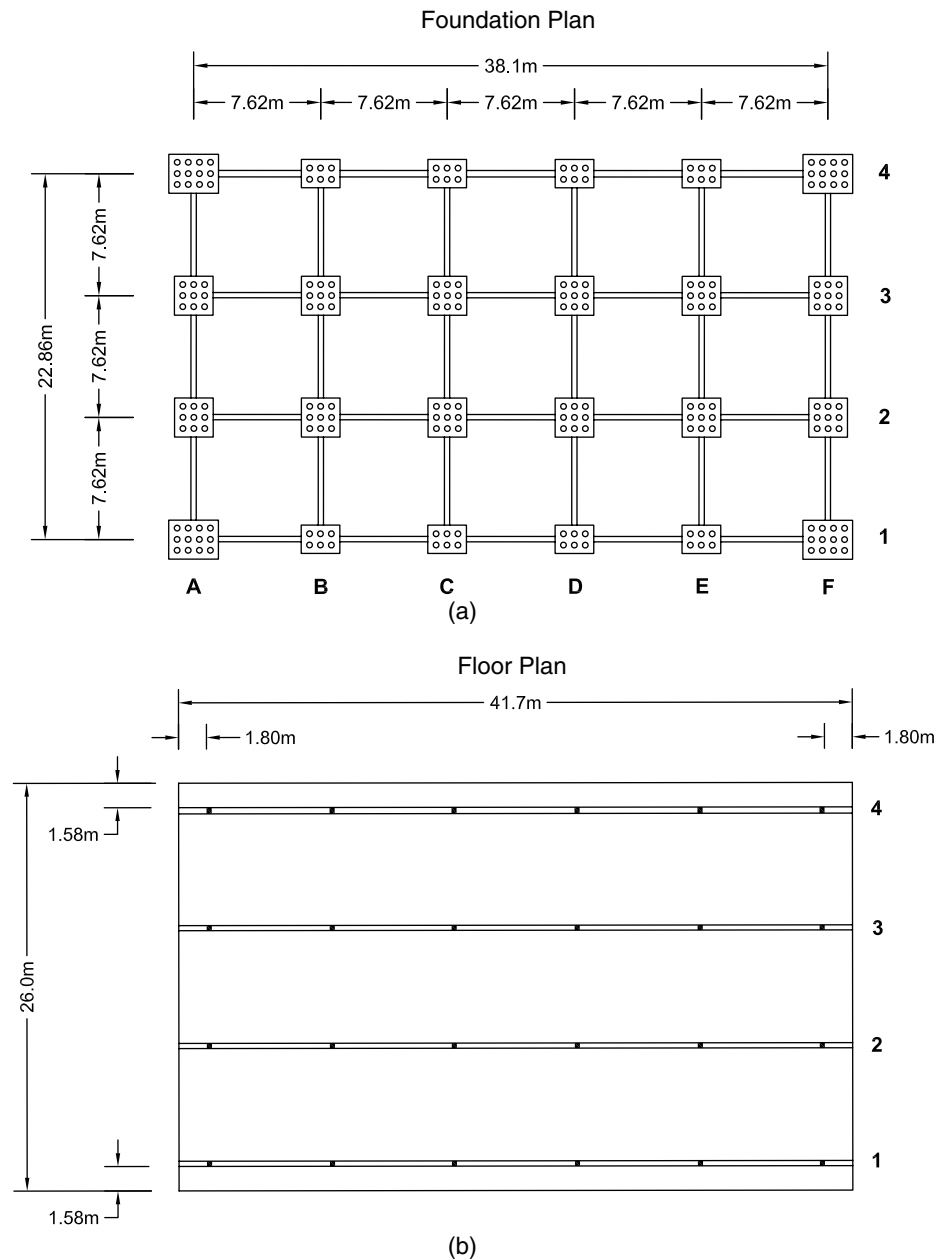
Foundation and ground-level plan and typical floor layout of Imperial County Services building. Note: Transverse (Y or north-south) and longitudinal (X or east-west)
